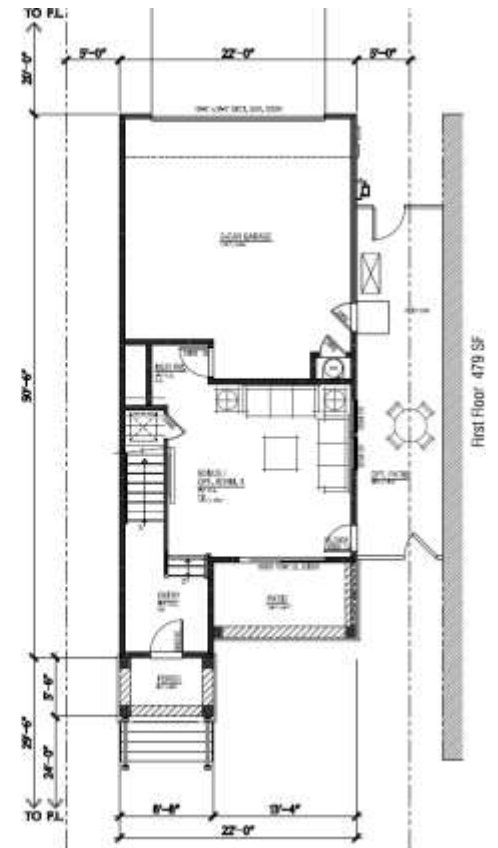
Conceptual Elevations and Floor Plans- Plan 4
